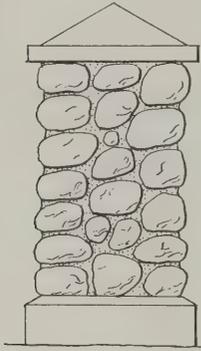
Improper Method of Building Stone Piers or Ends of Walls
